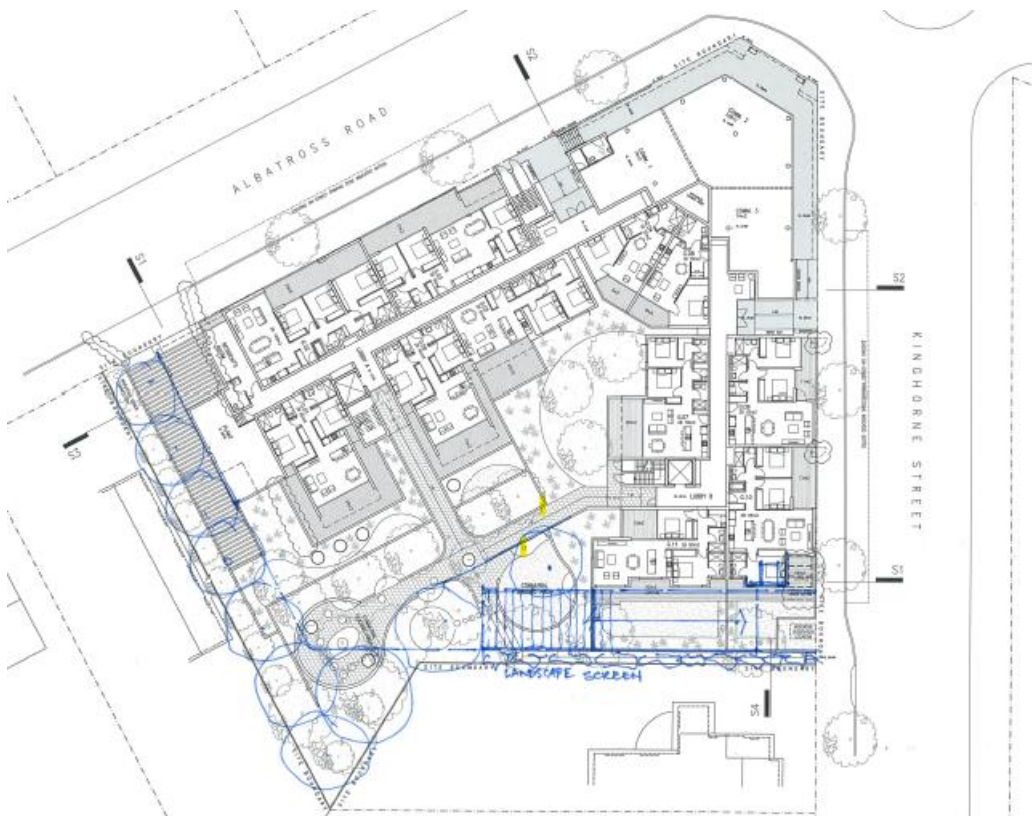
Applicant's submitted concept plan, demonstrating that access via Kinghorne Street is capable of being achieved.
